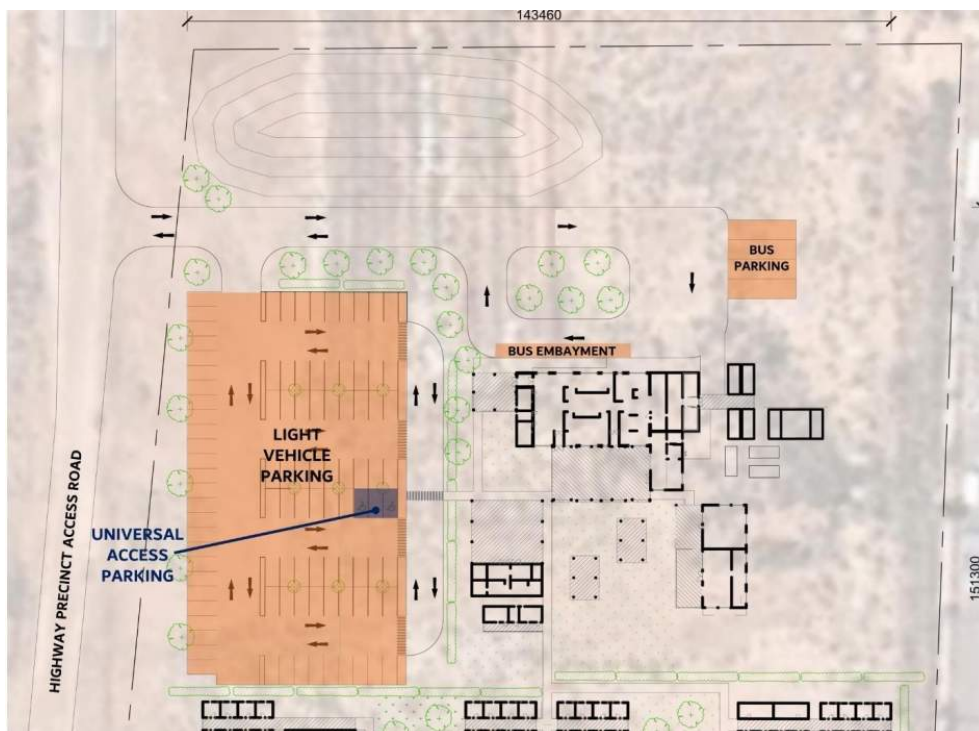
Location of the proposed on-site parking across the site (base plan source: Grounded, 2022)
